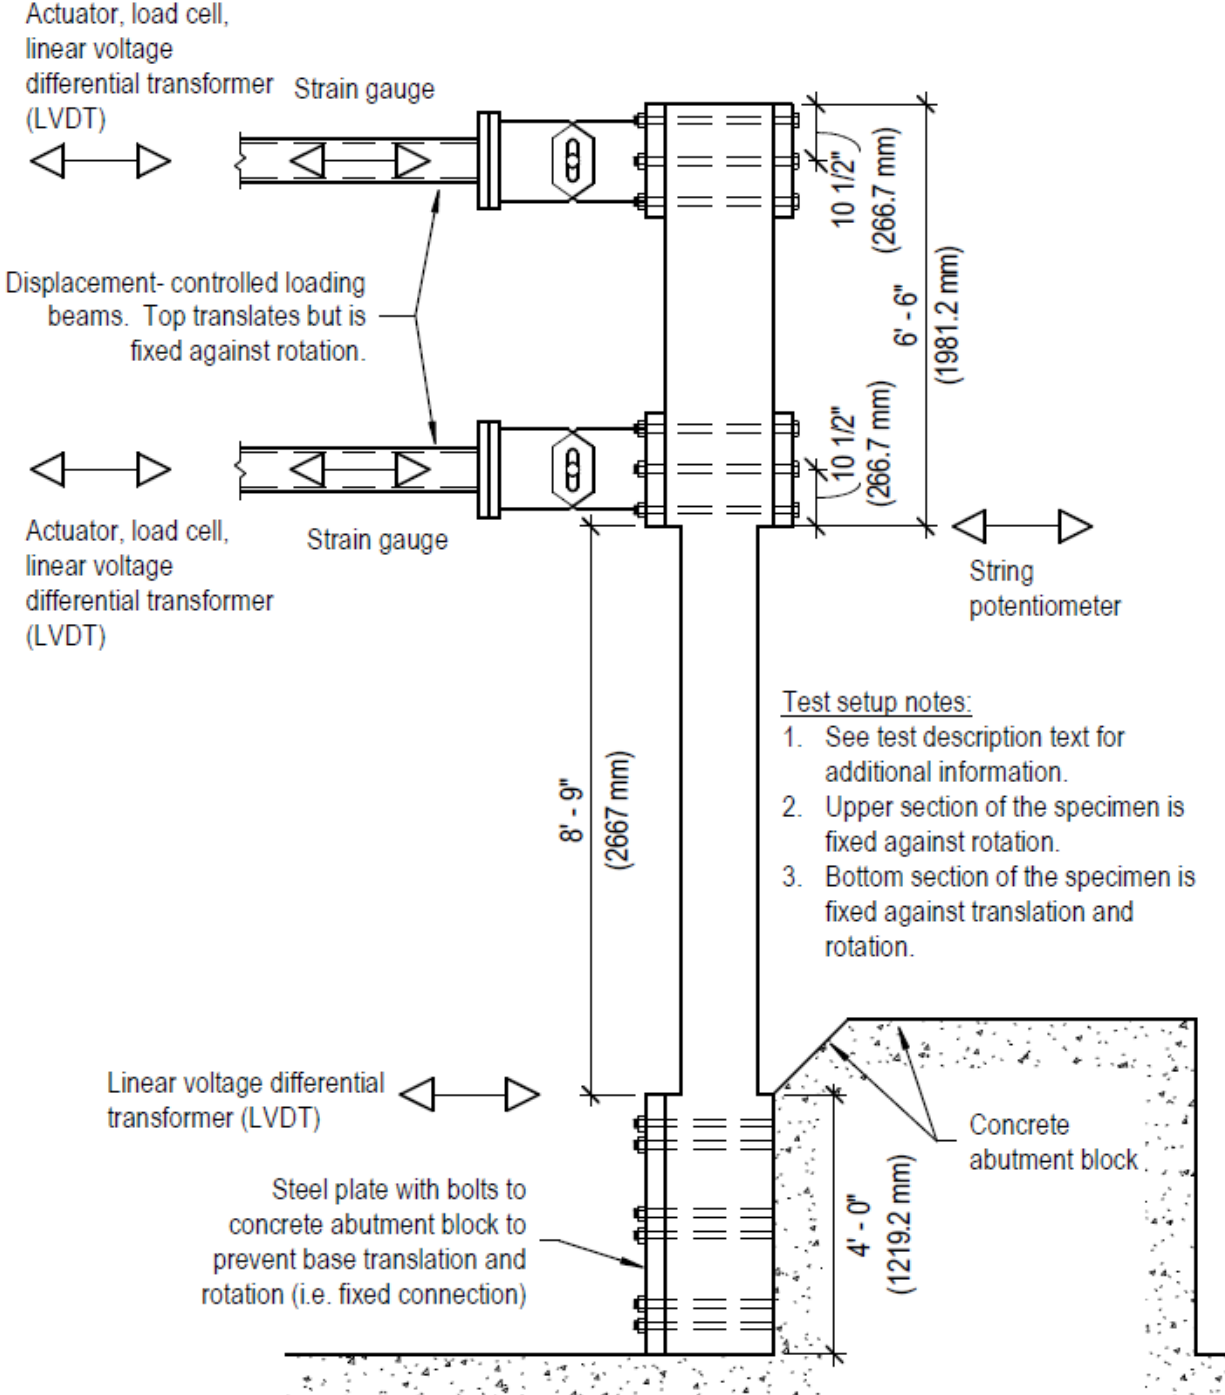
Schematic drawing of test setup. The base of the specimen is bolted to the concrete abutment to restrain translation and rotation. At the top of the specimen, the actuators are coordinated to apply horizontal translation only (i.e., the displacement of two actuators is equal).
